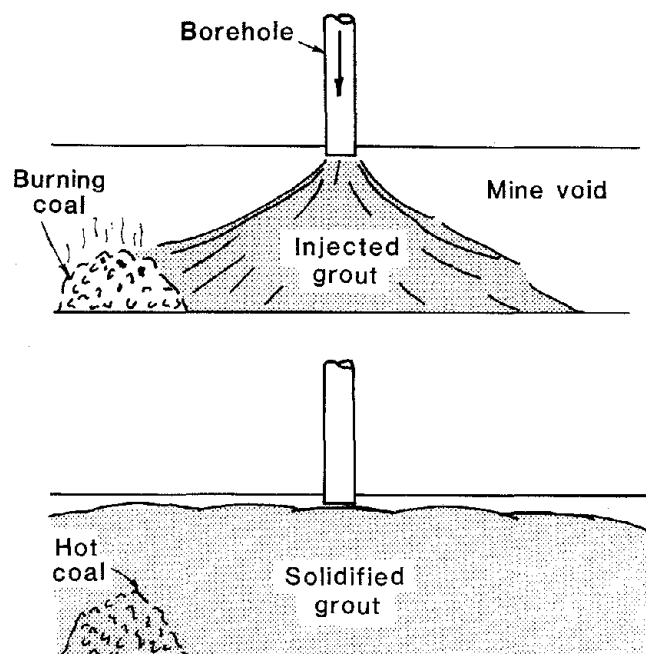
Injection of foaming grout or cellular concrete to encapsulate burning coal.
